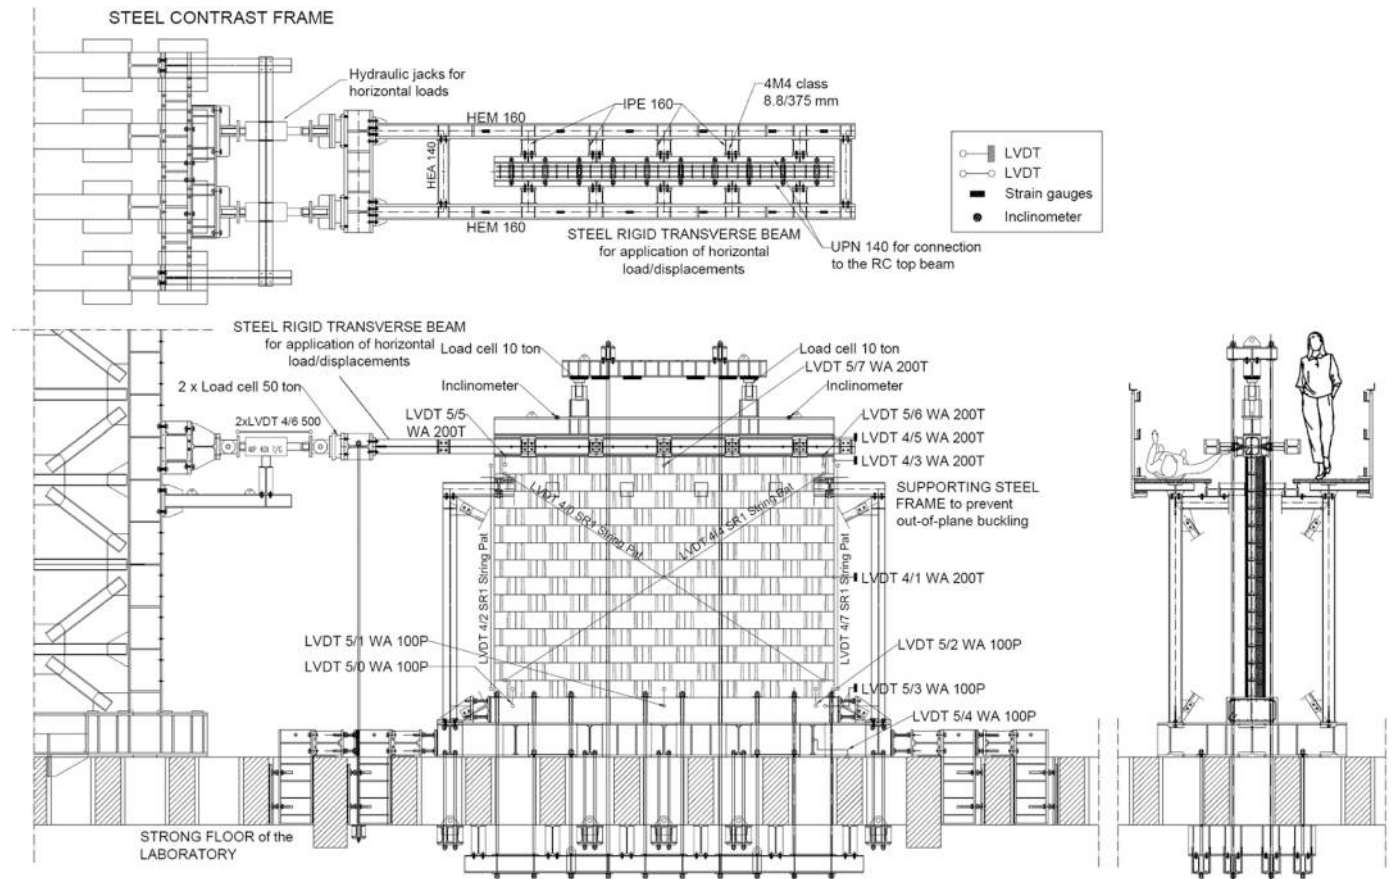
Overall test setup with connection to the strong floor and the strong wall of the laboratory, supporting steel structures and localization of test instrumentation (specimen with L/H ratio 4:3).
